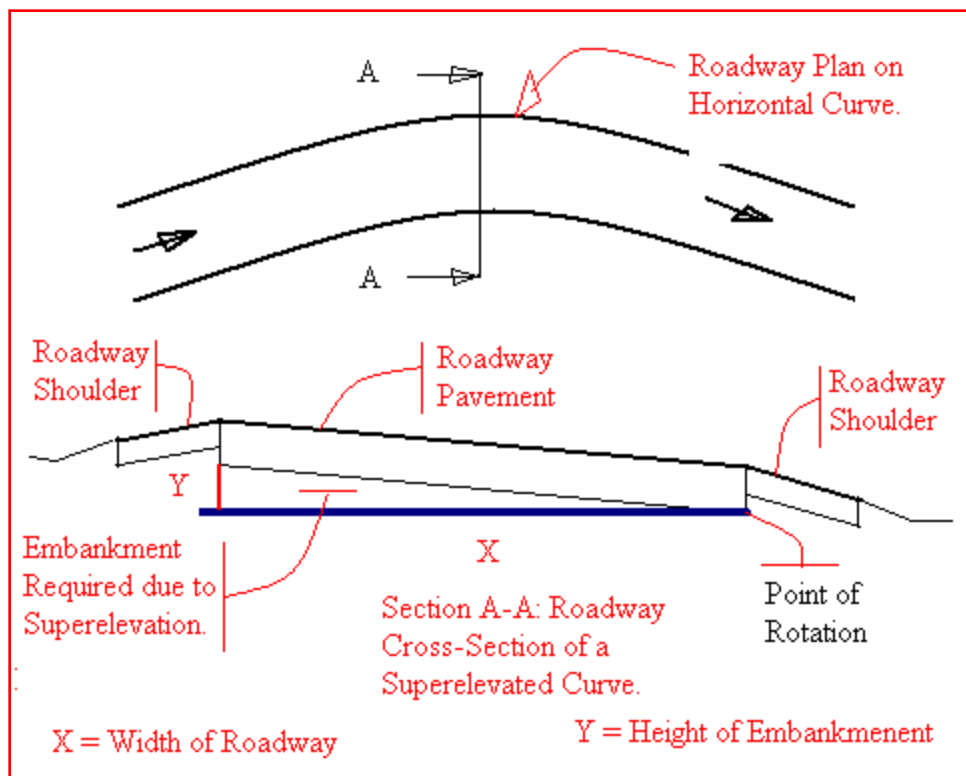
Plan and Cross-Section of a Superelevated Highway Horizontal Curve.
